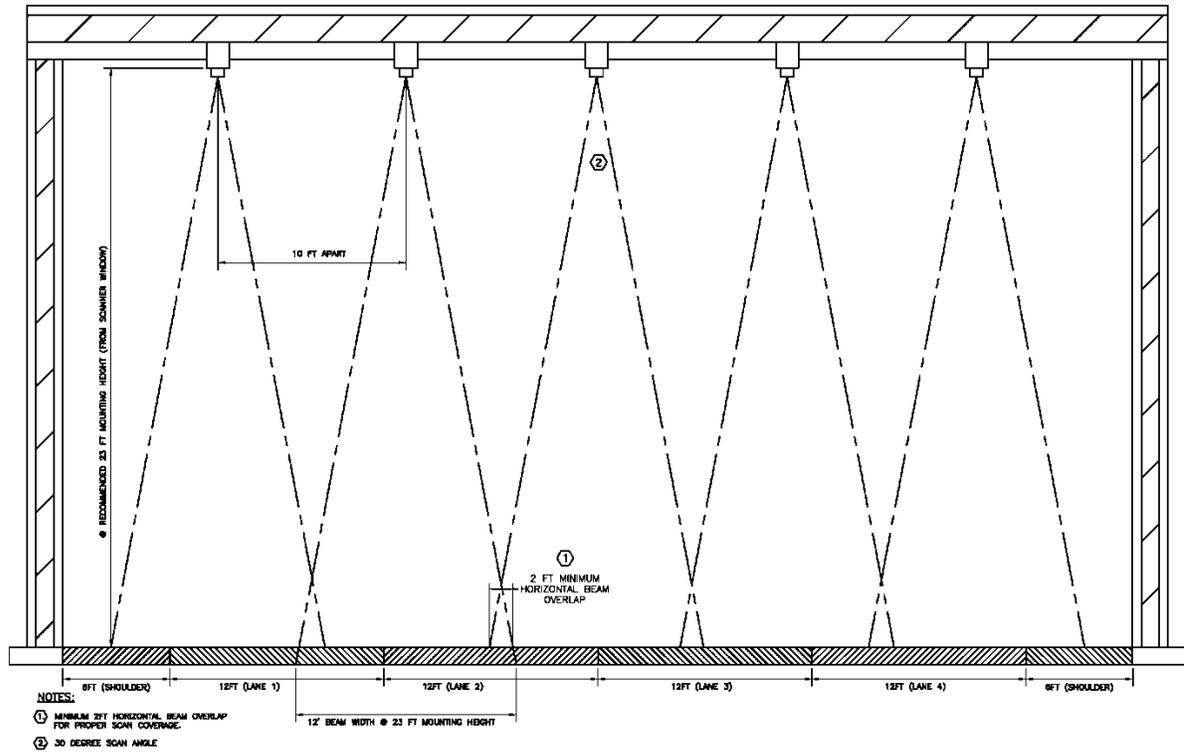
Elevation of Typical AutoSense Open Road Installation with Shoulder Coverage
